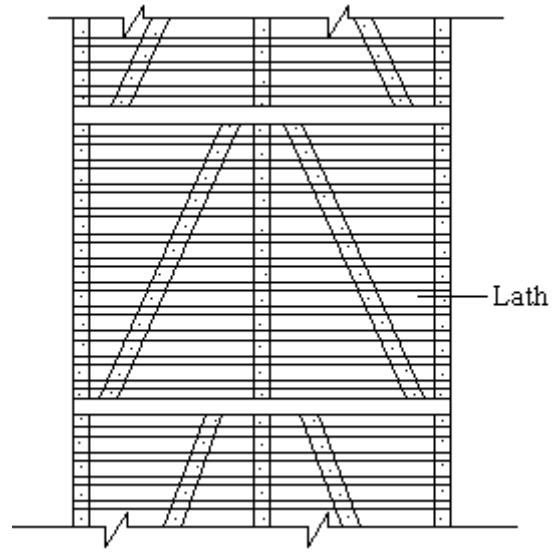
(continued) Traditional Timber Building with Stone Fill in Rize
